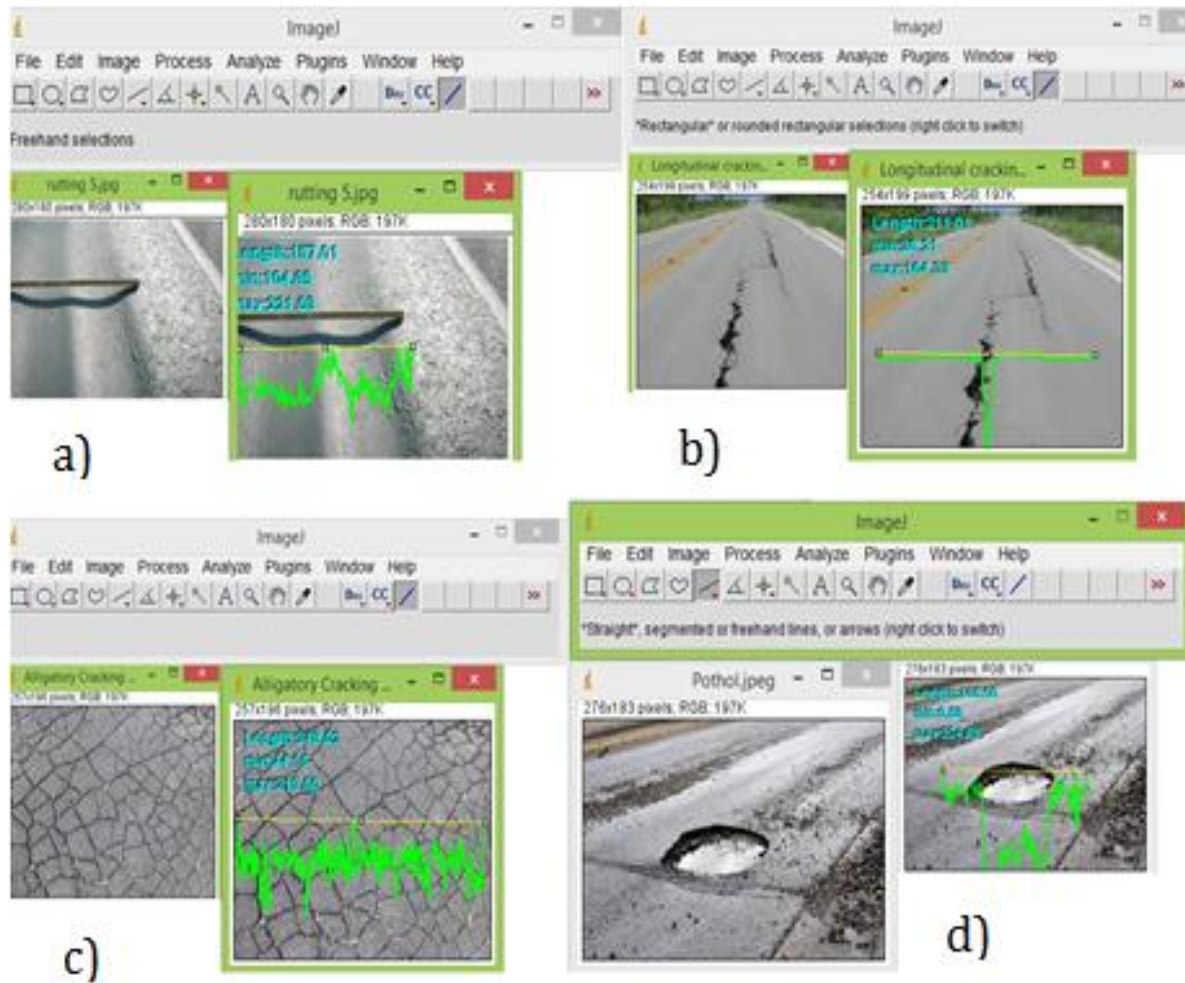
Distresses profile drawing tool Results: a) Rutting b) Longitudinal Cracking
